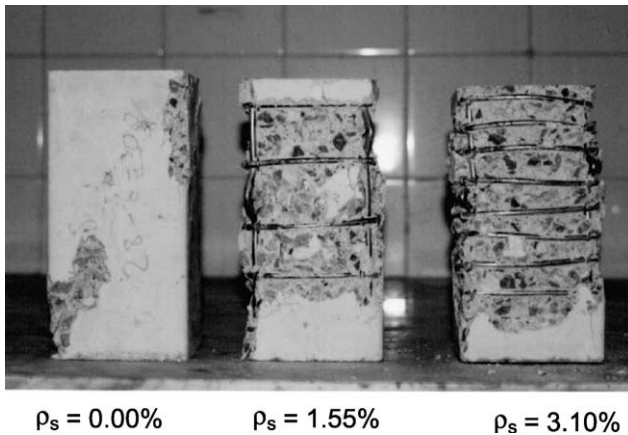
Mode of failure of expanded clay lightweight 100×200 prisms confined with steel stirrups.
